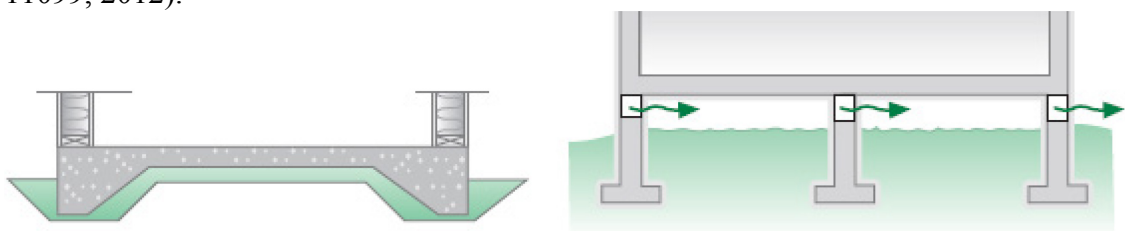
Slab-on-grade to the left and open-air ventilated base floor foundation to the right (Weltner, 2003).
